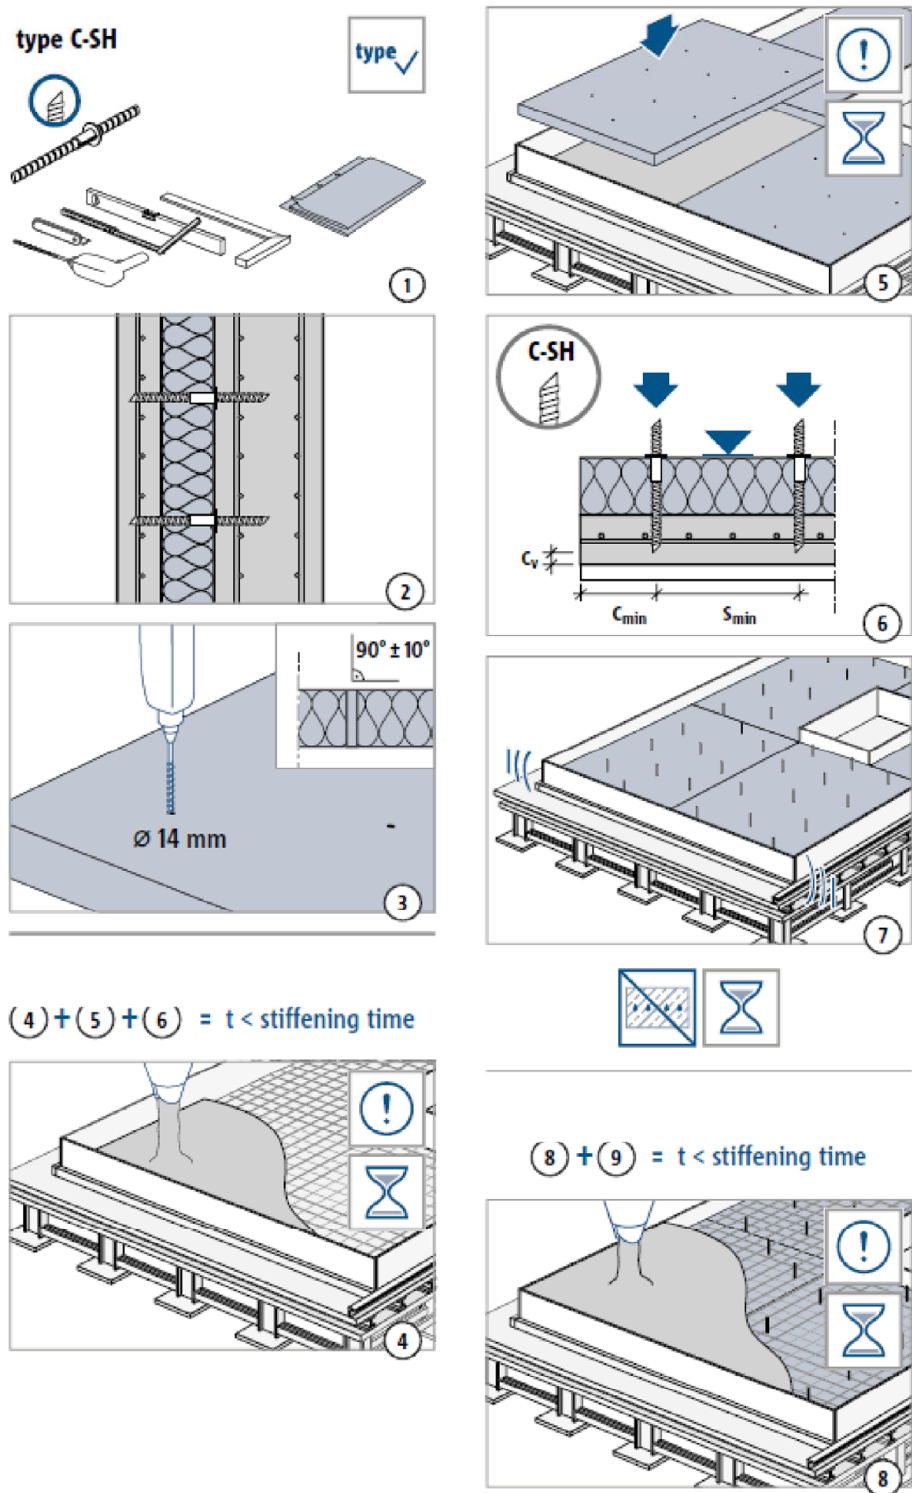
Installation instruction - Schöck Isolink® for sandwich wall – page 1
